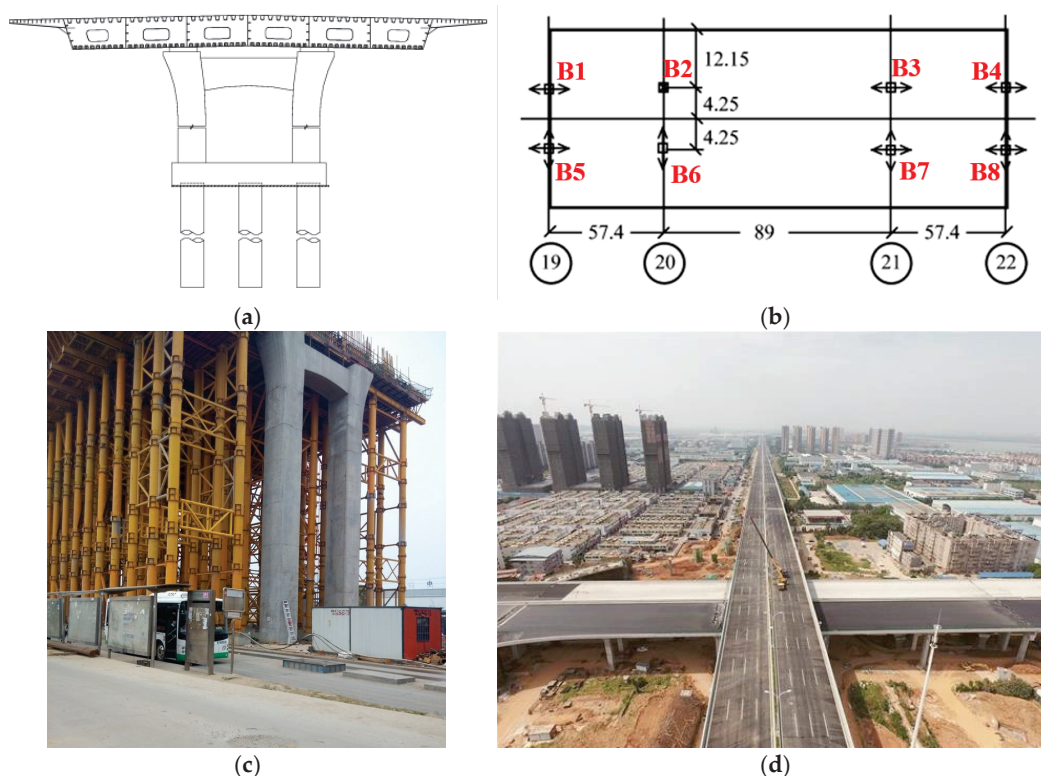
(a) Cross section of bridge L7, (b) plane view of bridge L7 with the layout of bearings (arrows denote possible movement directions), (c) side view (in construction), and (d) deck view (deck pavement). All dimensions in m.
